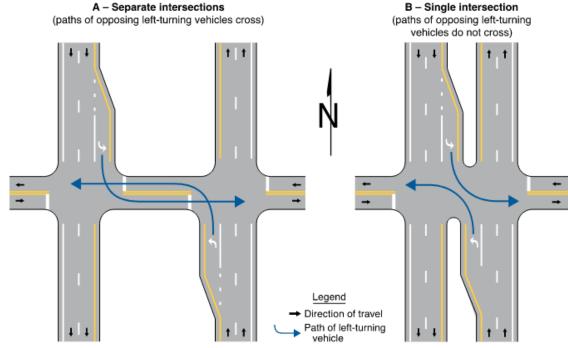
A-5. Intersection Configuration at a Divided Highway Crossing
